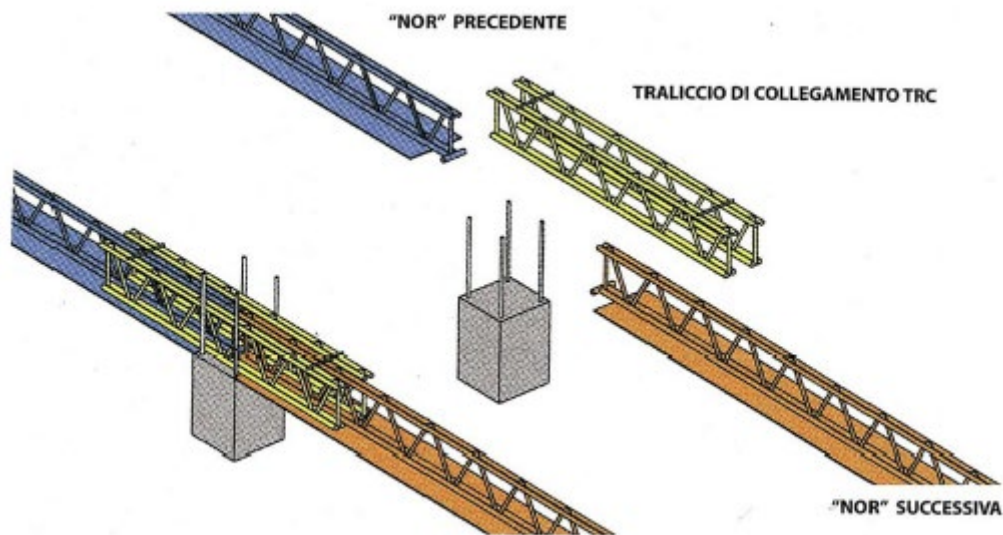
Additional steel truss for the connection at nodes between two CSTC beams NOR.
